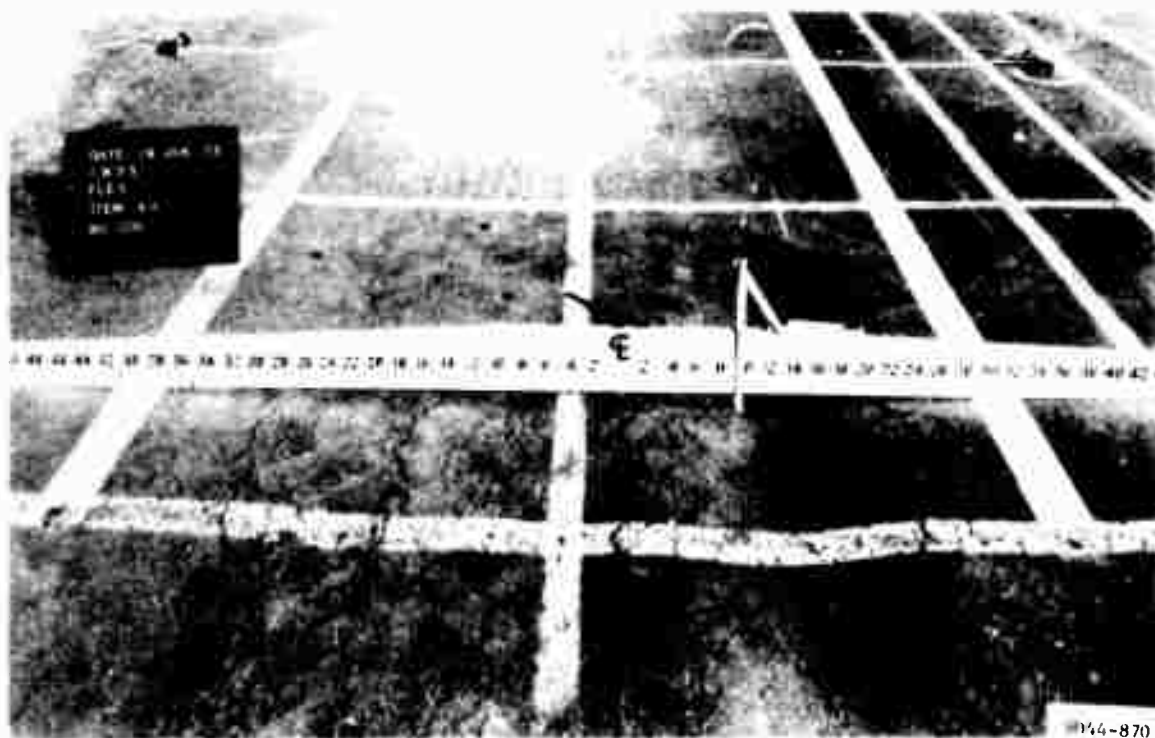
Cracking in subitem 4a, lane 3, flexible pavement test section, after 80 coverages of 50-kip single-wheel assembly
